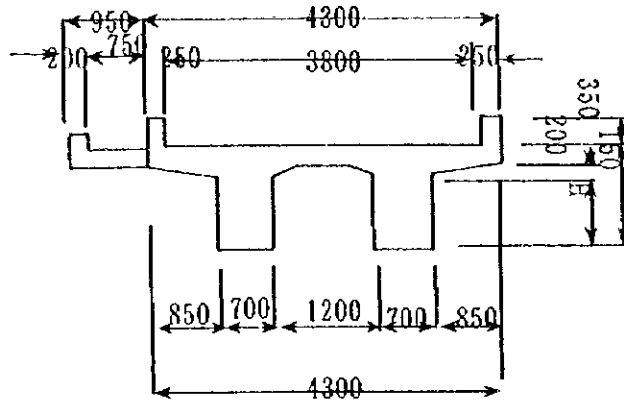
Typical Cross Section of Bridge at 334 pk 3
